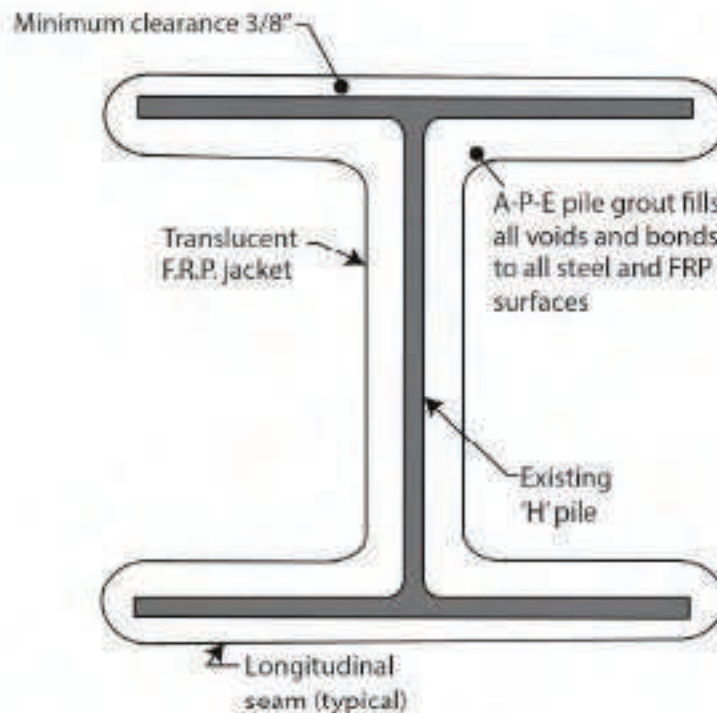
FRP Jacket for Strengthening Steel Piles
